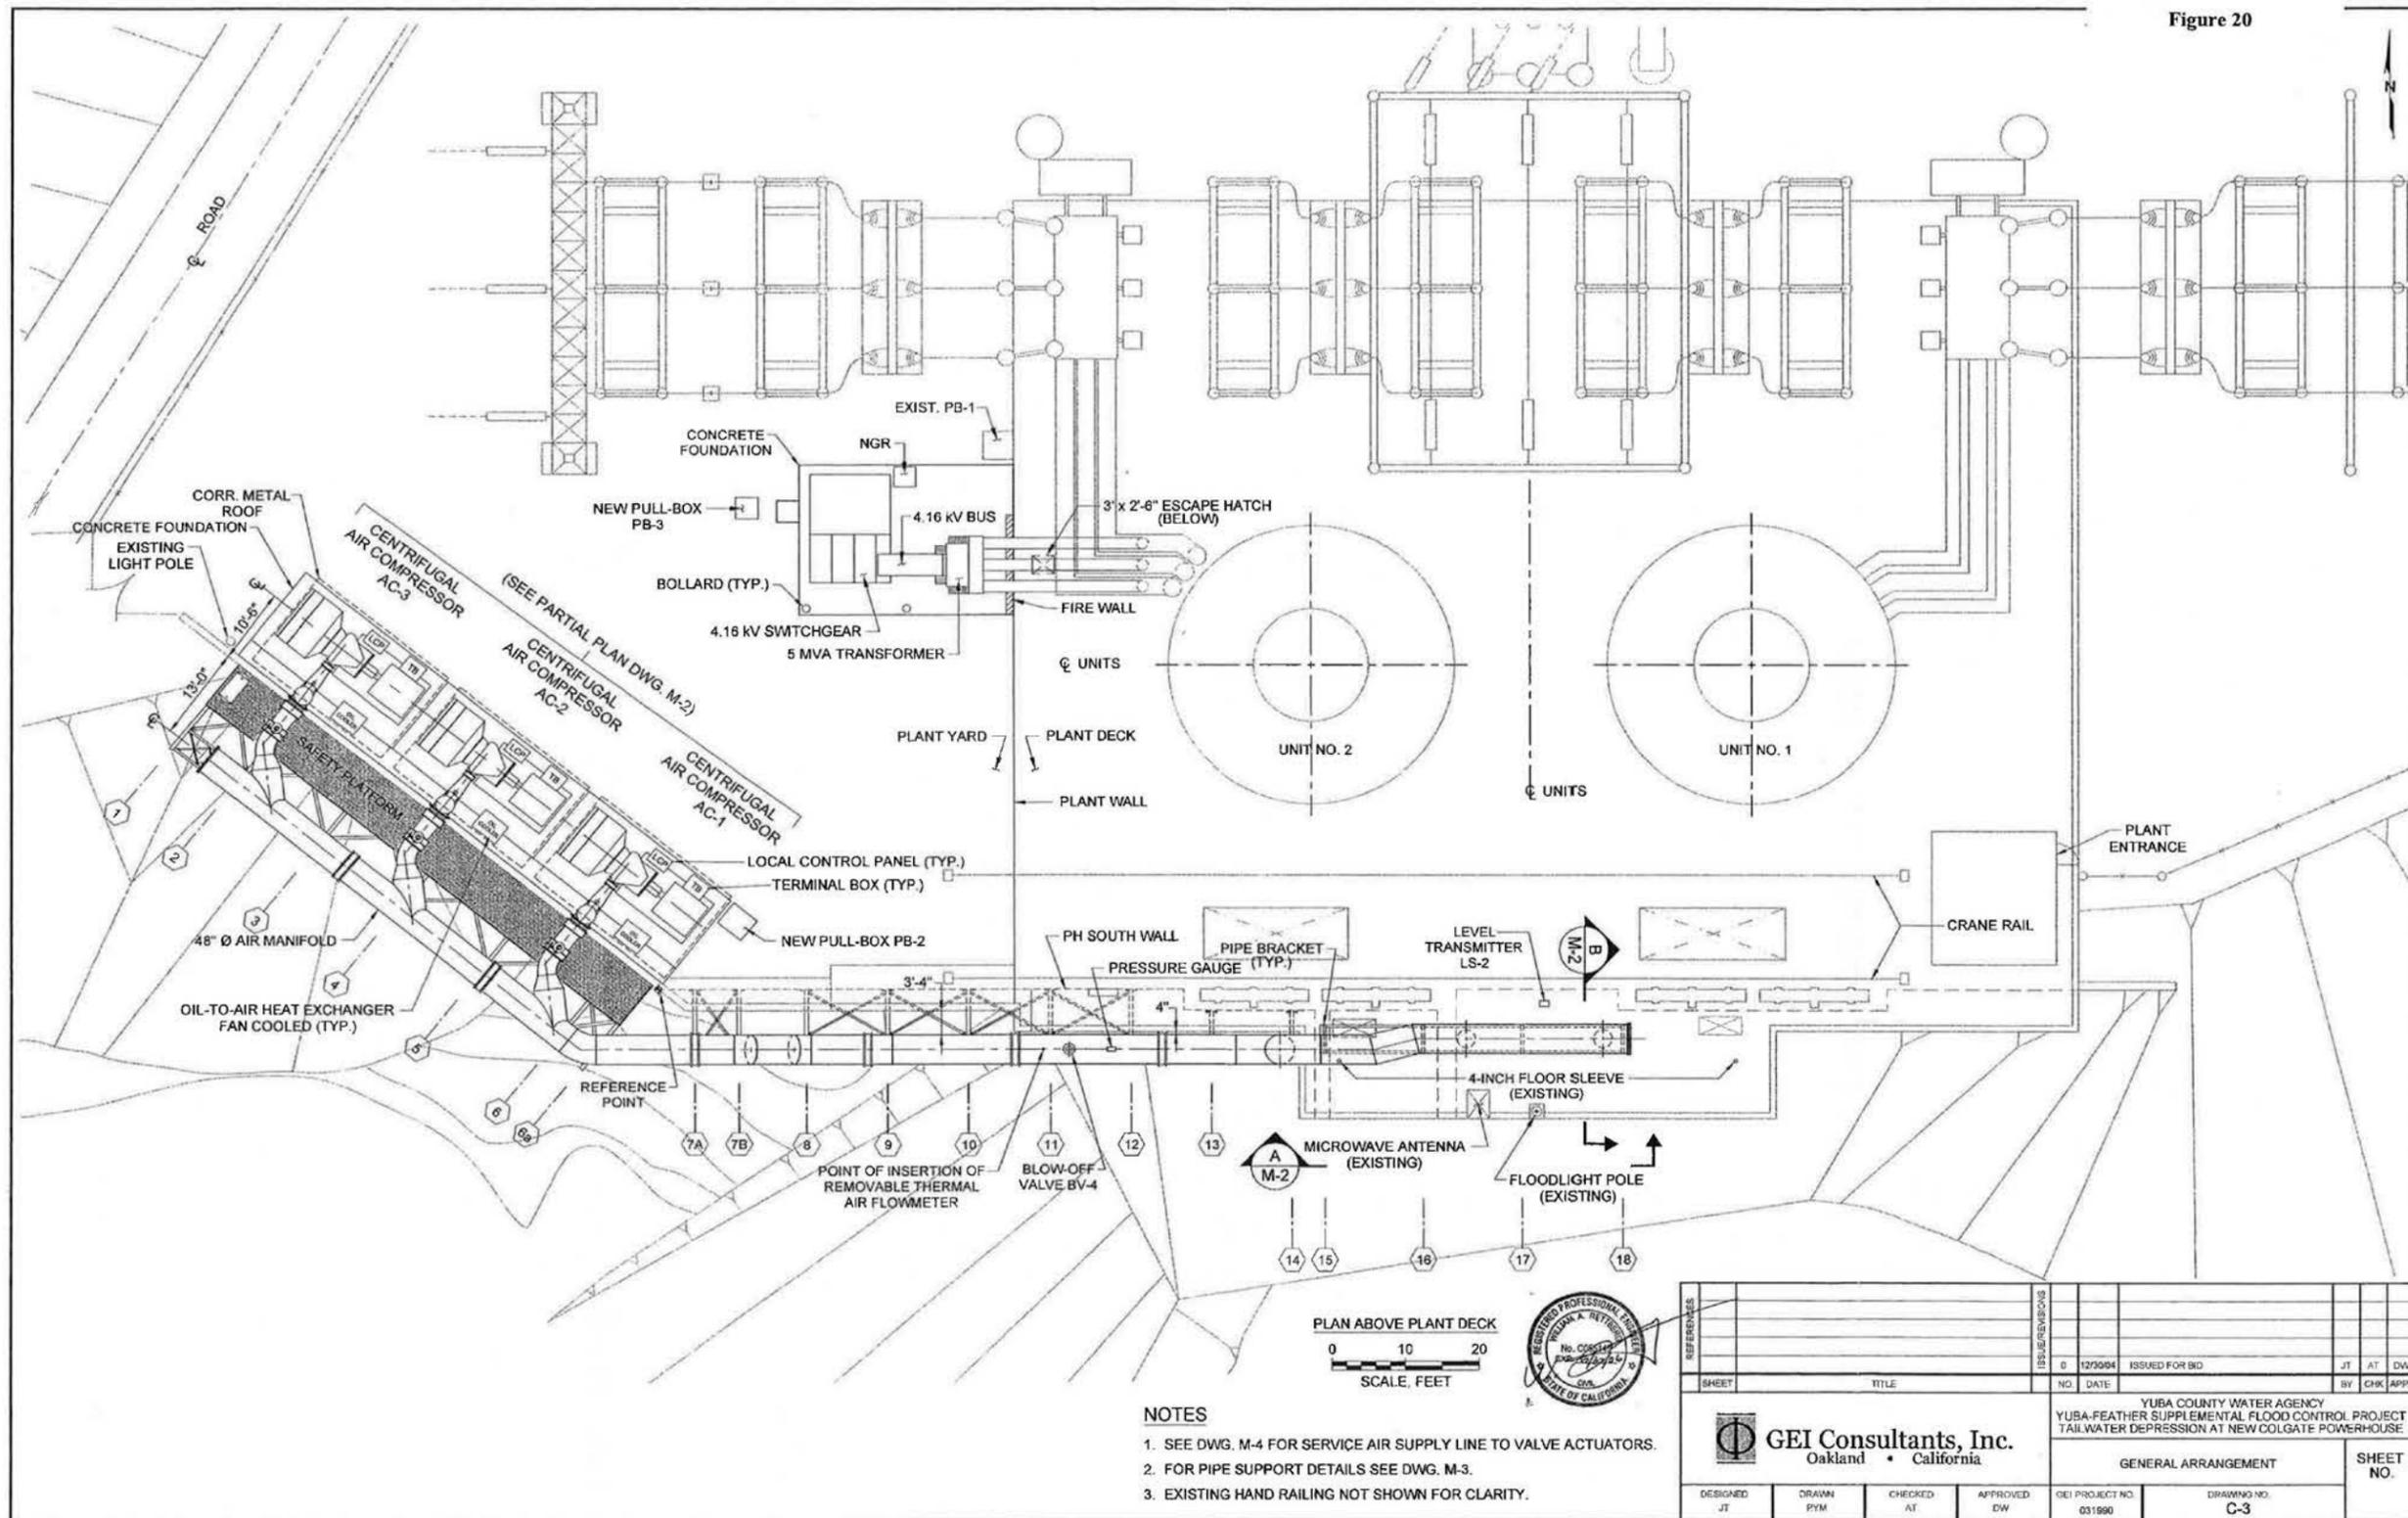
General arrangement for YCWA's proposed New Colgate Powerhouse TDS.
